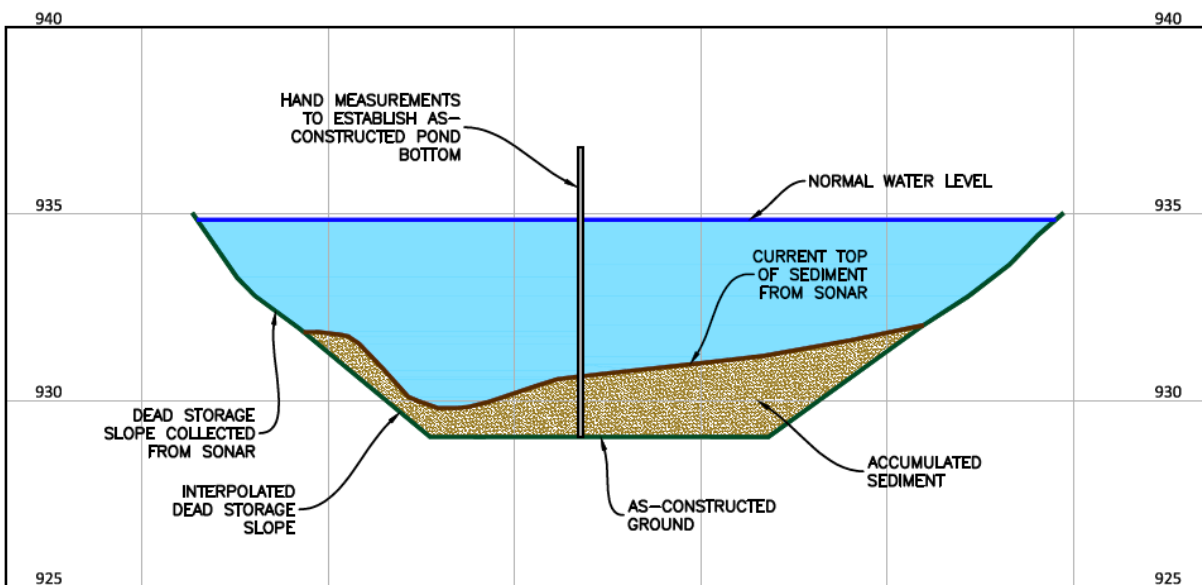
Comparison of stormwater design plan vs. as-constructed pond from sonar information.
